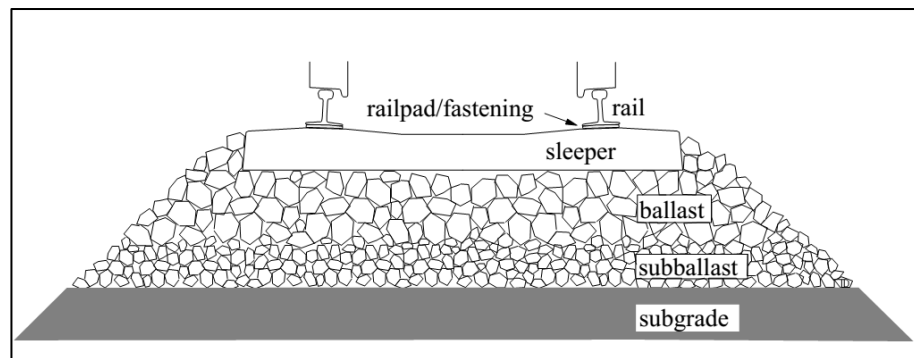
Cross section of conventional ballasted track (Dahlberg, 2003)
